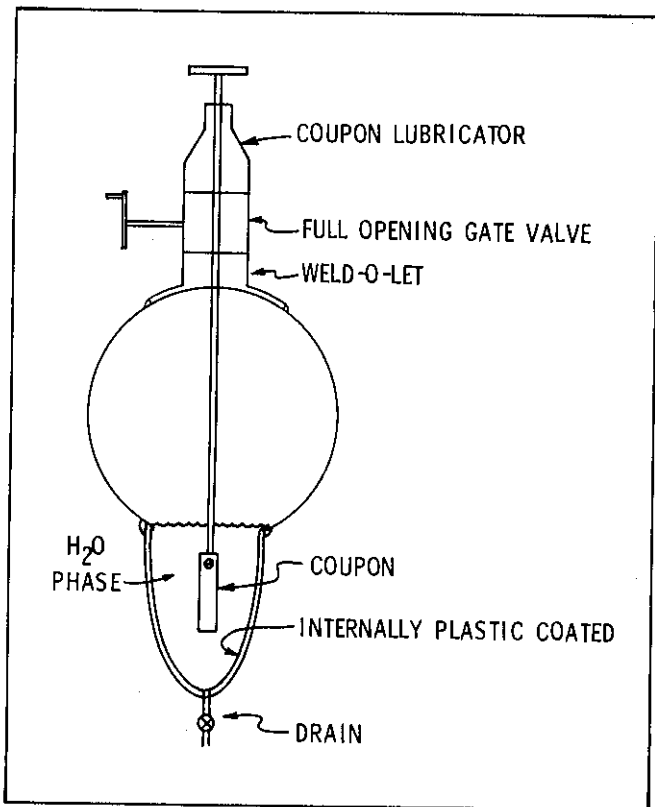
Flat coupons installed in water trap welded to bottom of a pipe line.
